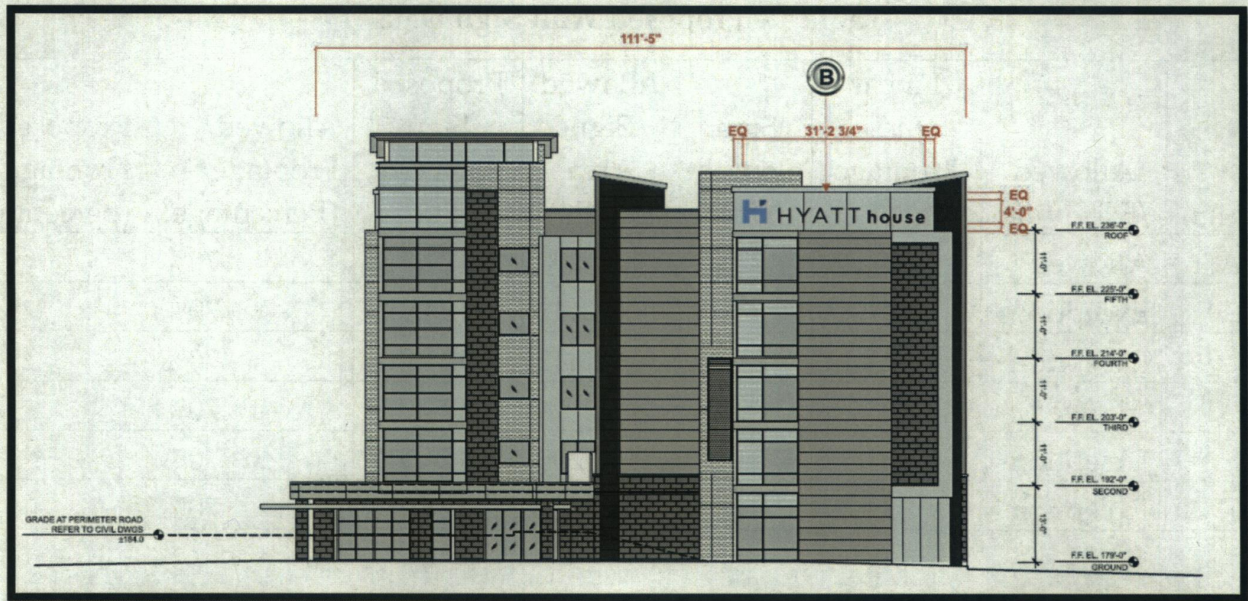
Freeway Oriented Wall Sign (Facing I-280)
